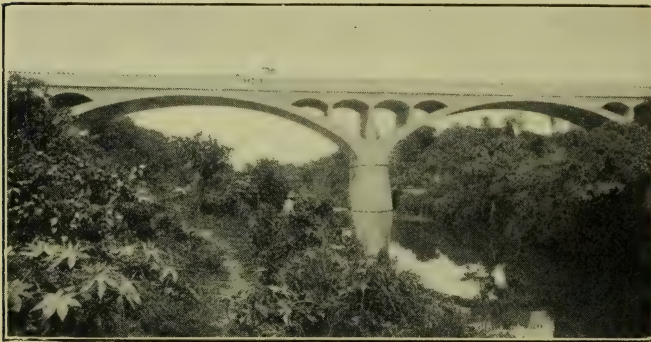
Vaughn Bridge, on Manila South Road, P. I.
